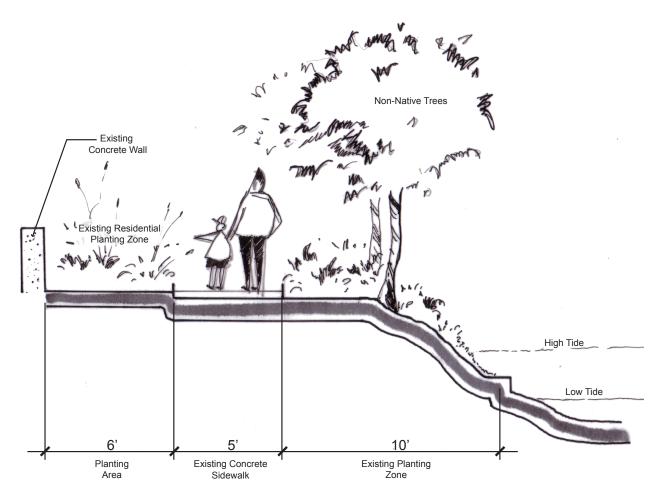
Section of the walkway along the east bank sidewalk is buried underneath soil that currently acts as a bank, approximately four feet high where natural estuarine vegetation grows (See Figure 9). Given that the historical walkway, from house 3621 to the end of Grand Canal, house 3815, is below the high tide level, several times during the year this walkway is submerged (See Figure 10). In addition, the public access team noticed that since this sidewalk does not connect to anything, it is rarely used, although it is designated as public access.
